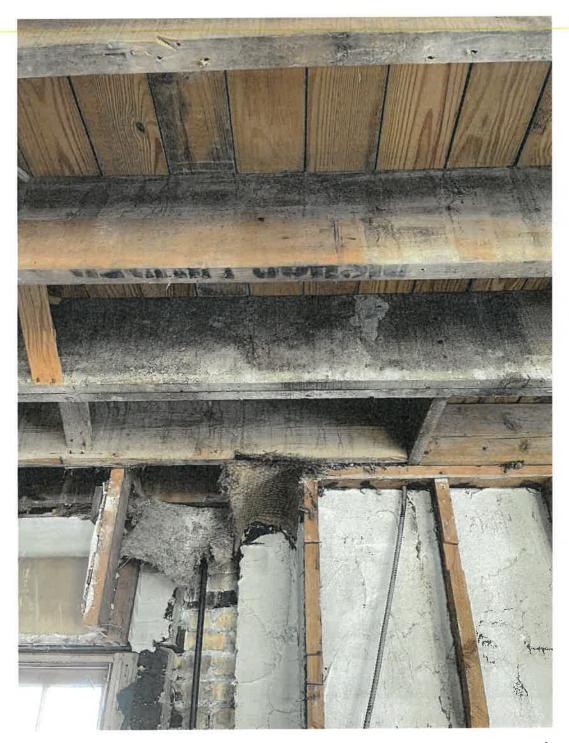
South Wing (First Floor) – Second floor wood joists and floor boards showing stain from moisture and possible mold
